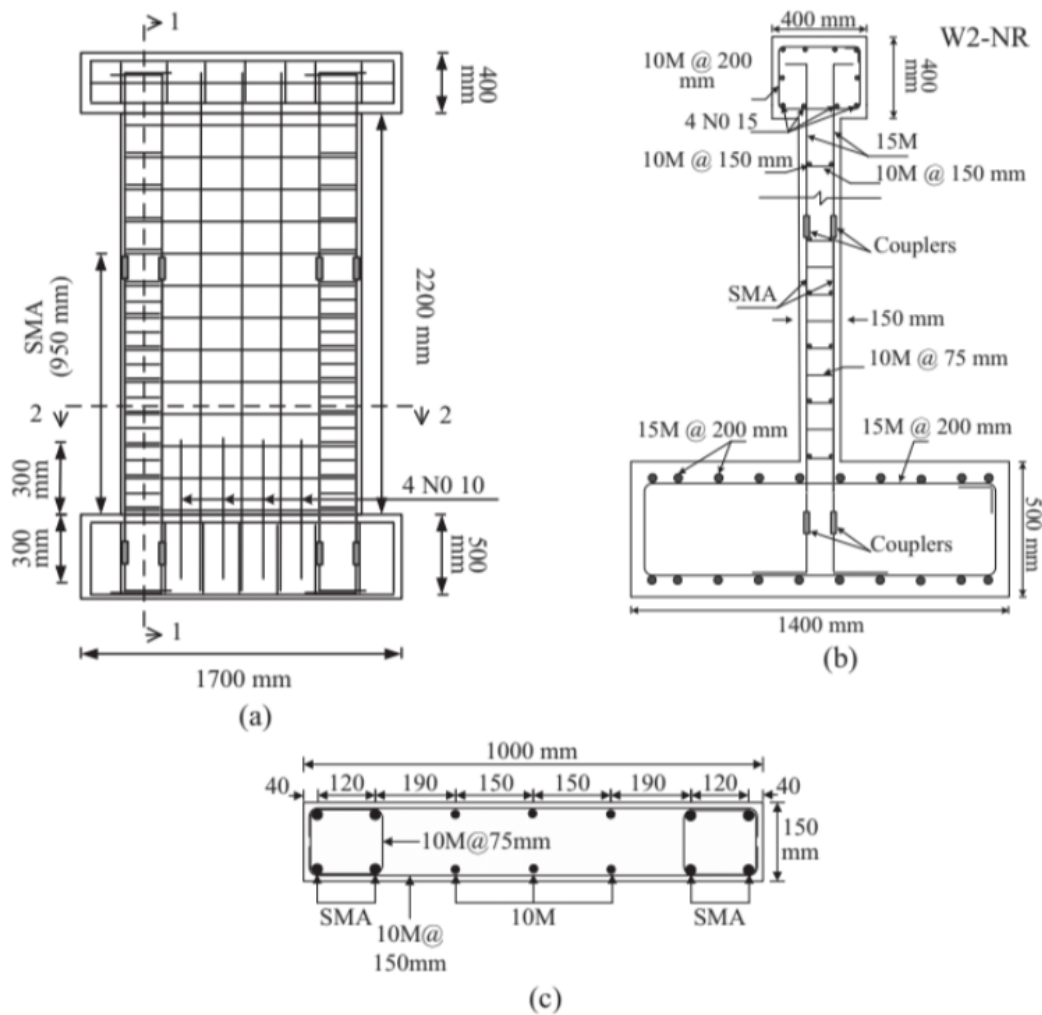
Reinforcement Details for the SMA-steel hybrid shear wall: (a) Elevation View; (b) Section I-I; and (c) Section 2-2 (Abdulridha & Palermo, 2017).
